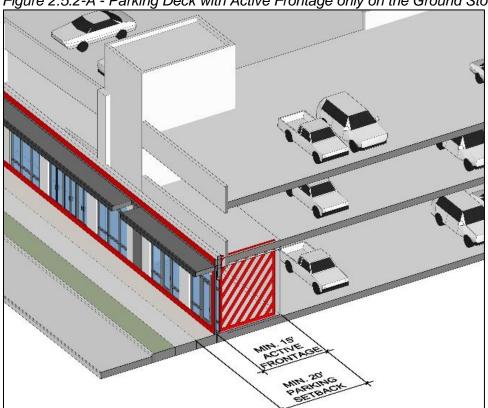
A - Parking Deck with Active Frontage only on the Ground Story
